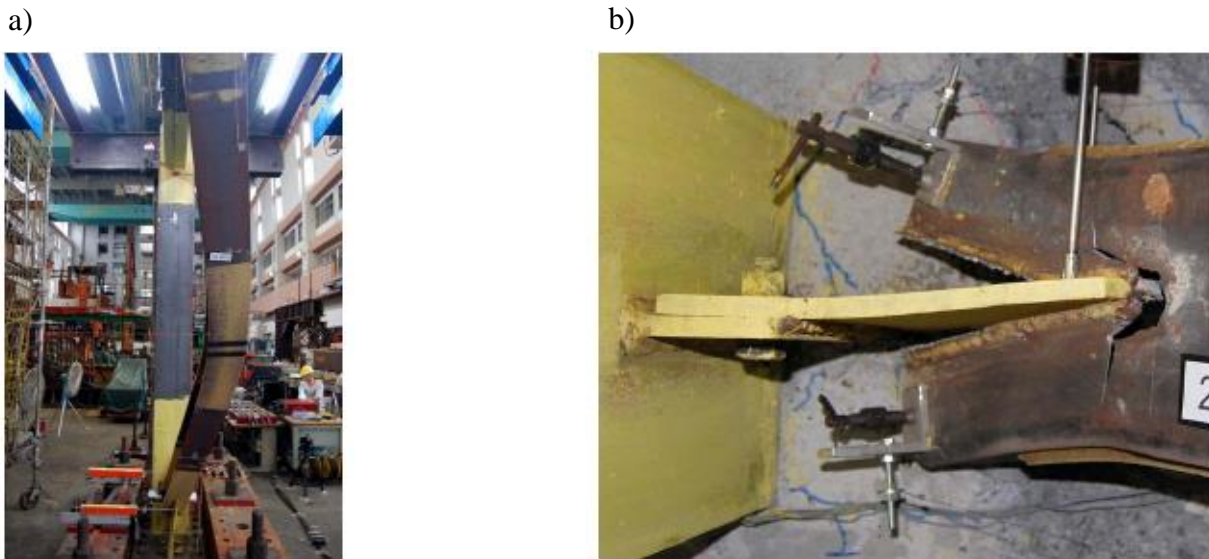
a) Out-of-plane deformation of wide flange brace; and b) Brace connection fracture at the second level (Sen et al. 2014).
